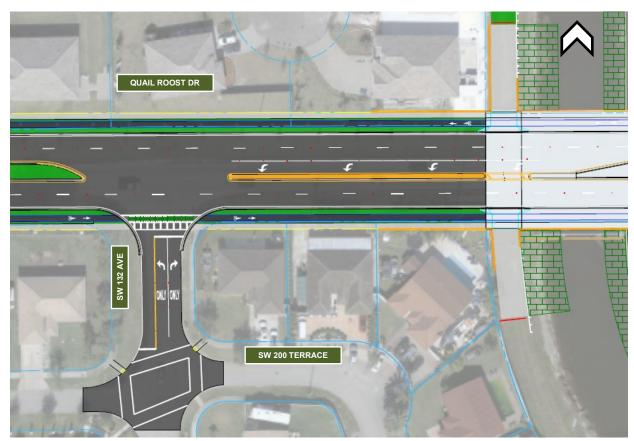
SR 994/Quail Roost Dr and SW 132nd Avenue Intersection
